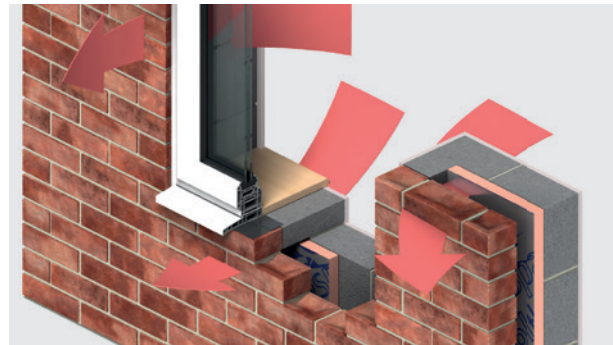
Heat Loss Paths Around a Typical Window Opening in a Masonry Cavity Wall Construction
